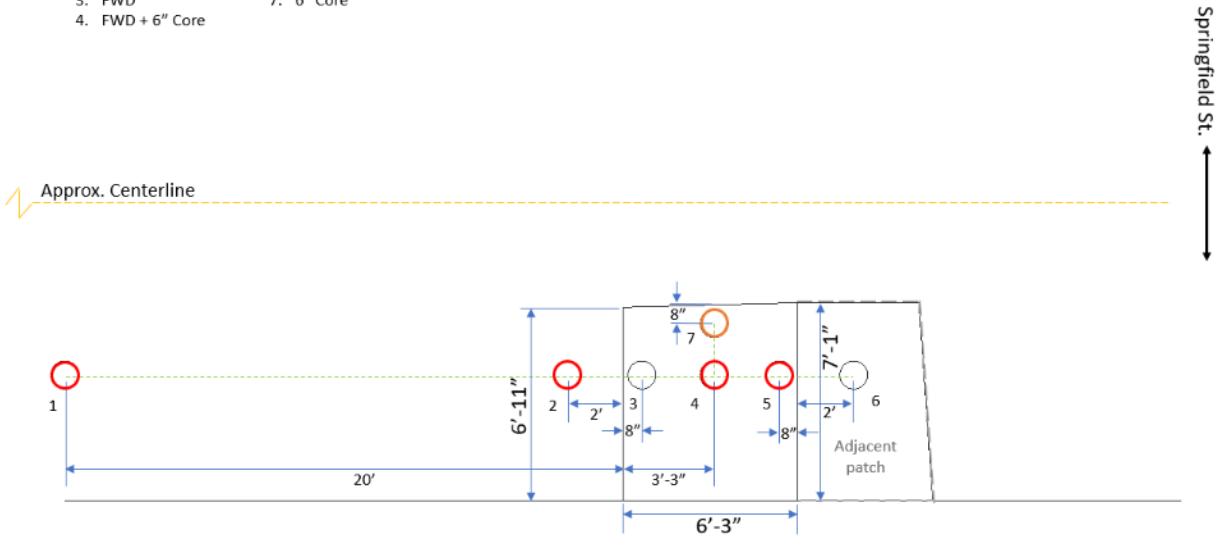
Repair dimensions and testing layout, N. Torrence and Springfield St. (1 ft = 0.3048 m; 1 in = 2.54 cm)
